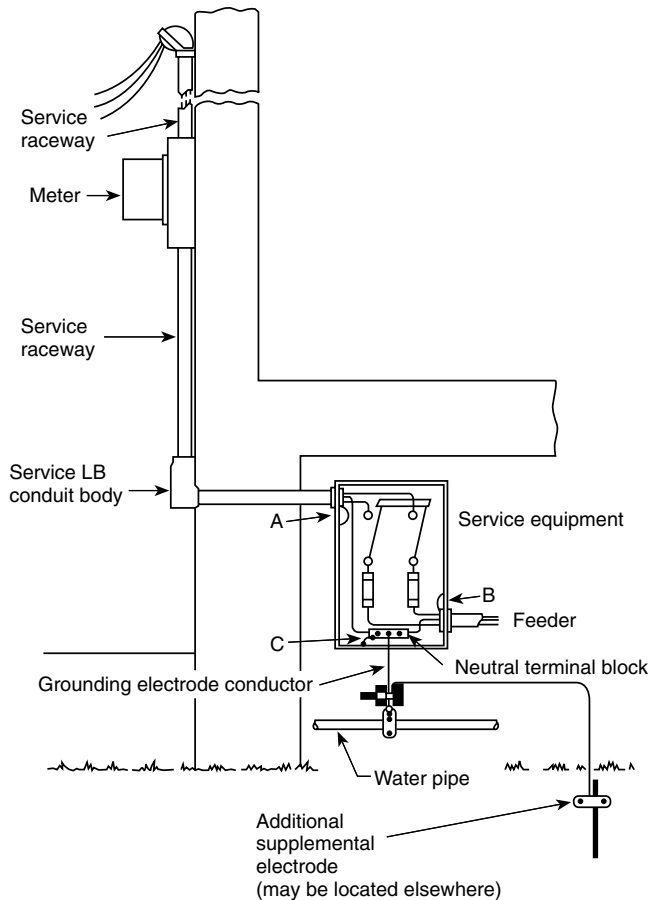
Grounding at a typical small service. A, B, and C are bonding connections that provide a path to ground.
